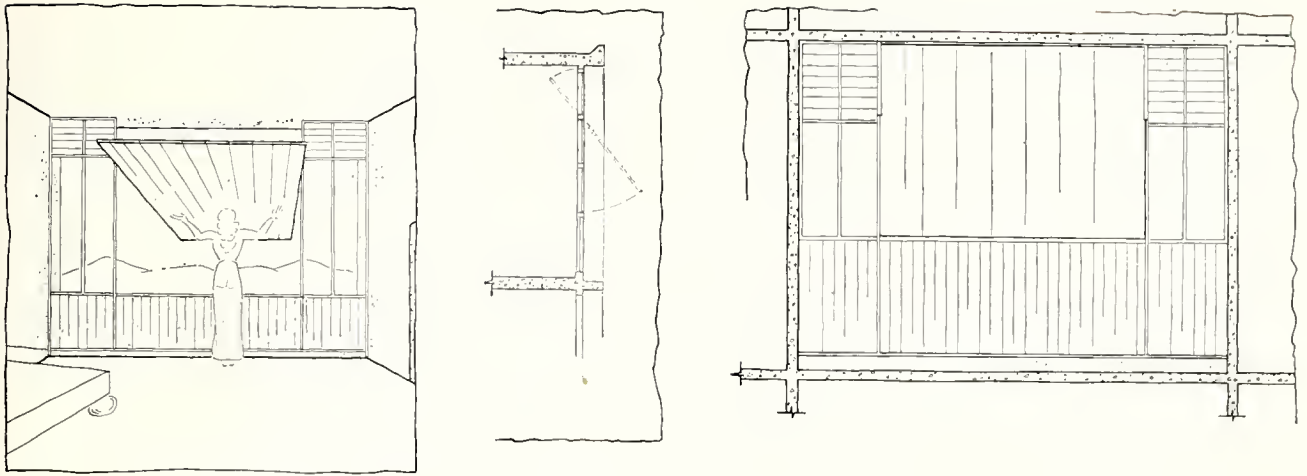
Pivoted Wall Section. Progressive Architecture.
